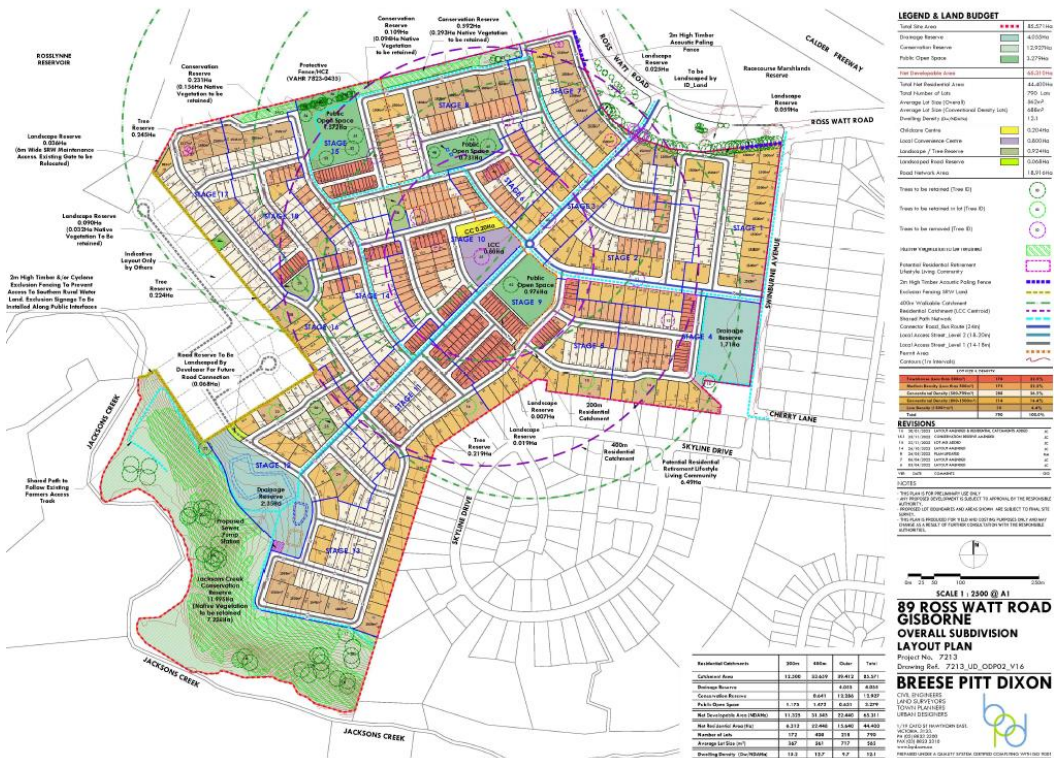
Overall subdivision layout plan. Source: DP p 33.
